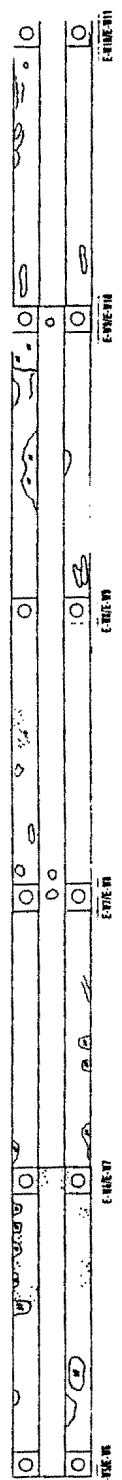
Sectional Elevation of P&H and S&P Sections of Pier
